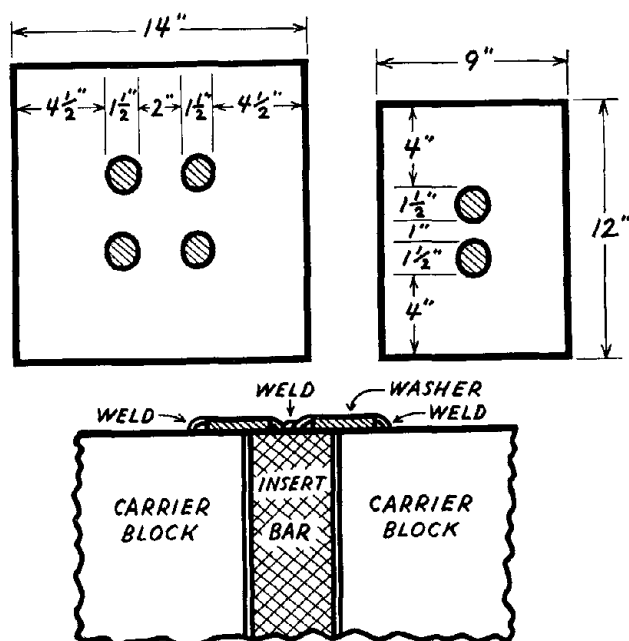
Details of spacing and welding of insert-bar in the carrier blocks
